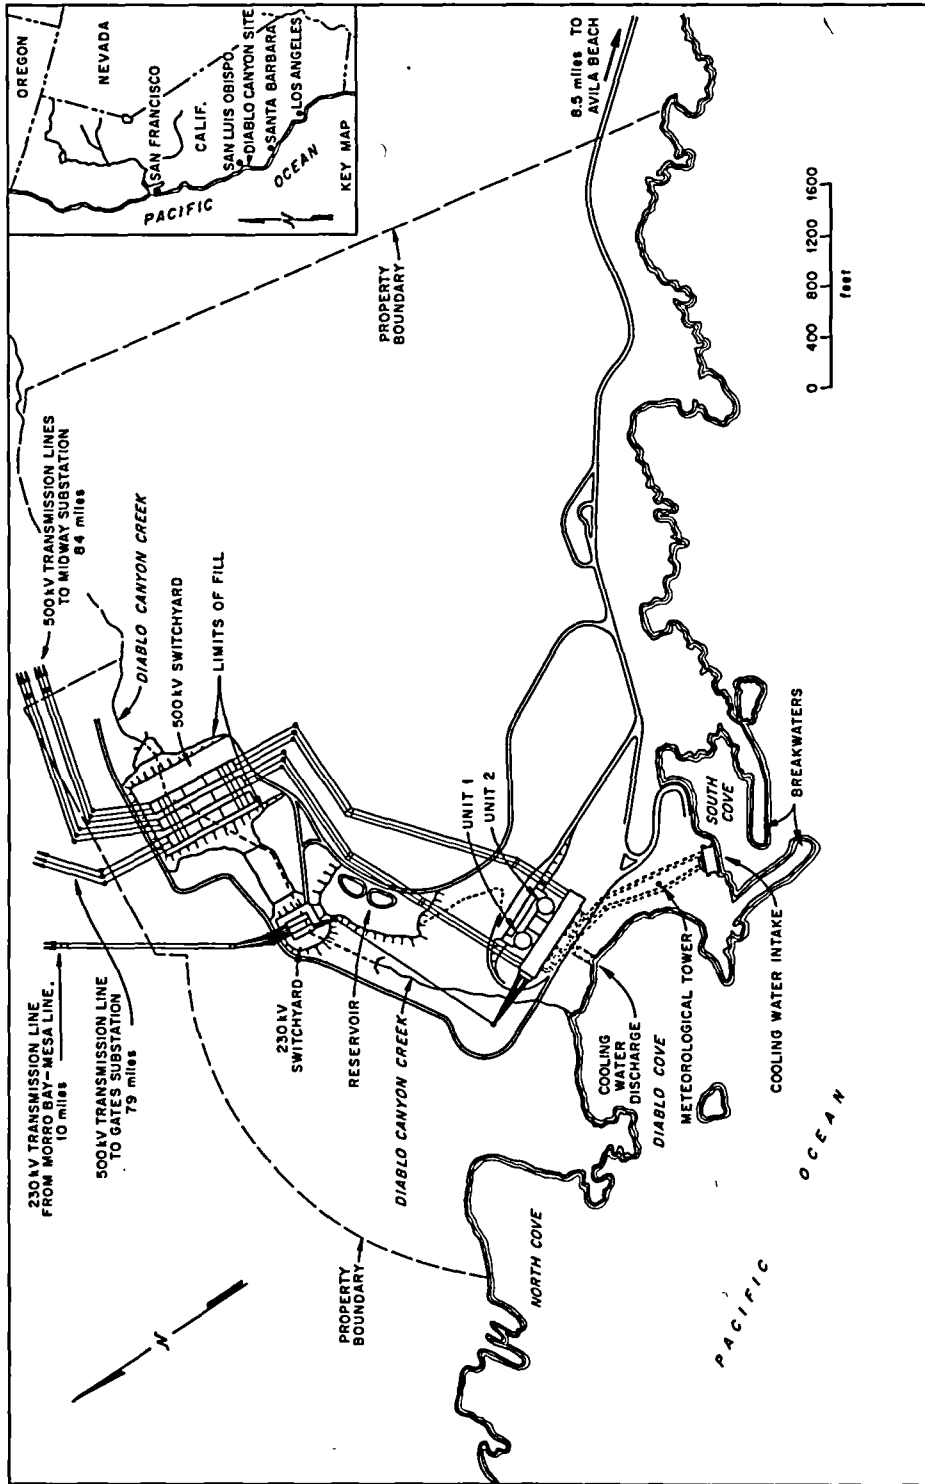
Plot plan of the Diablo Canyon plant site.
